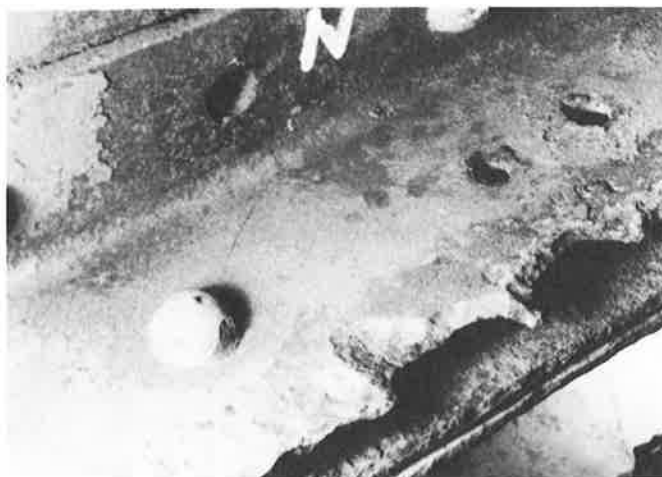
Extensive Corrosion Loss of Tension Flange
